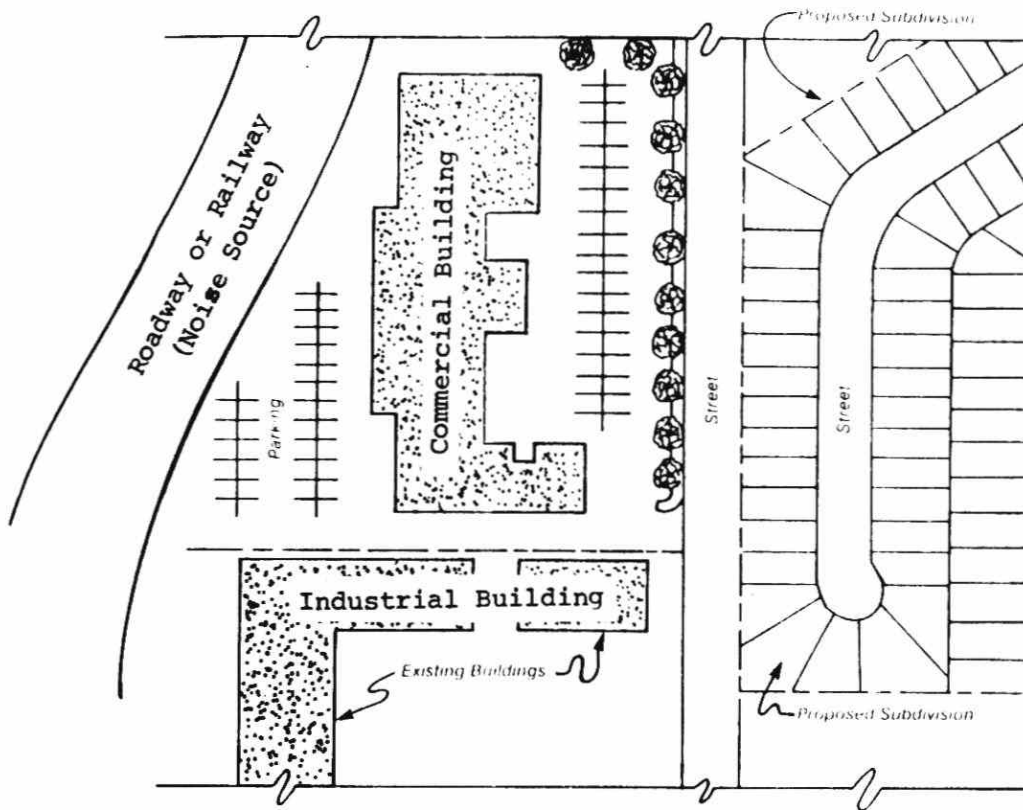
B.15(a): Commercial and Industrial Buildings as Intervening Structures
